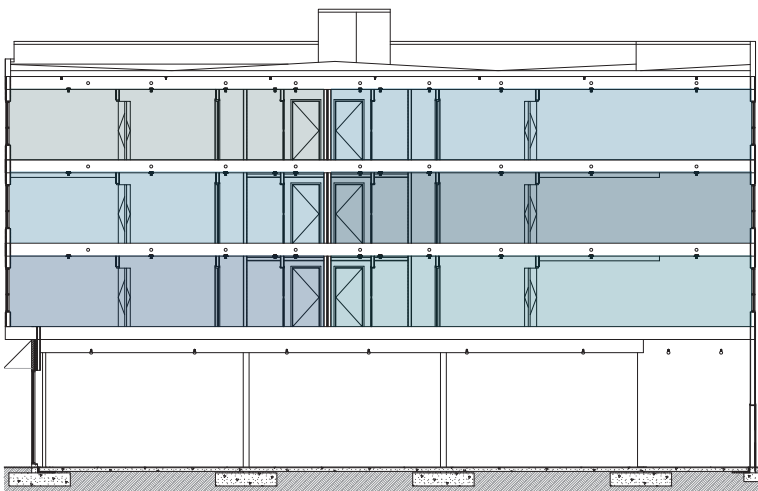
Section showing 3 floors of residential over first floor commercial space ("Plan Review No. 63480, Automatic Fire Sprinkler and Standpipe System - Nem, Rainier Ave Mixed-Use" 2017).
